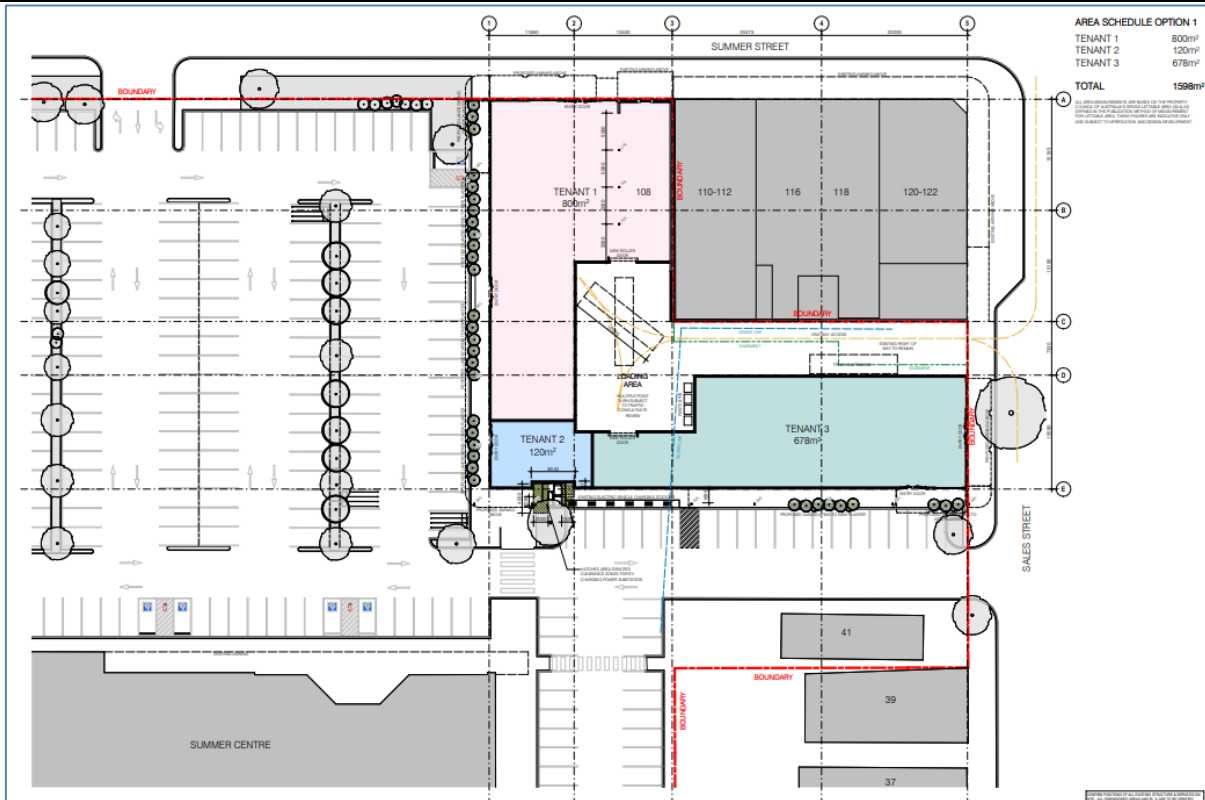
proposed ground floor plan (dwg DA23 [R05])
